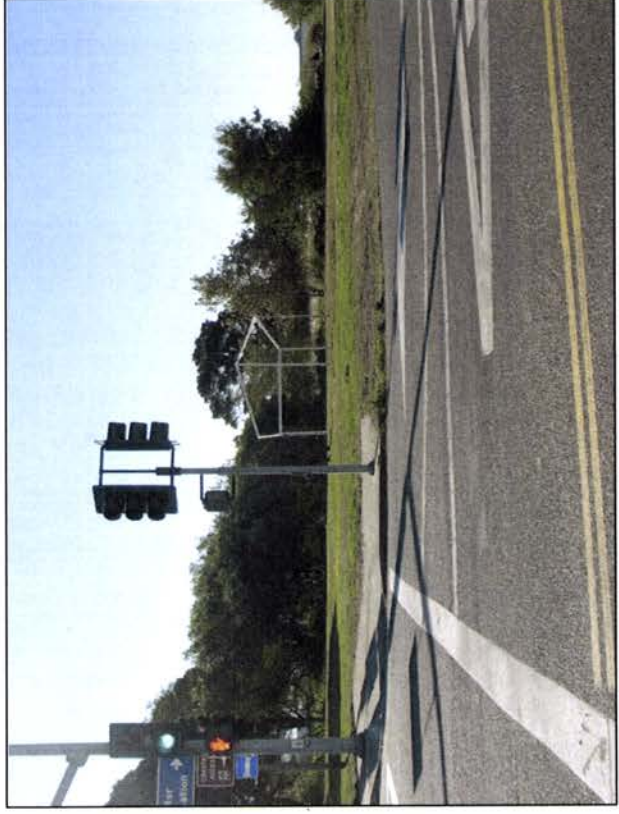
Looking Southeast from Westbound Front Street at Hwy 101
